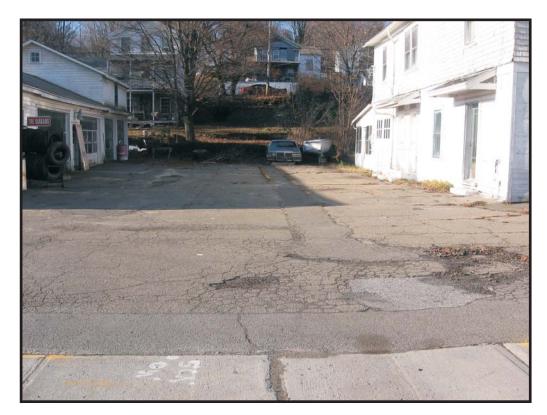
View looking west at south side of house/filling station at 15-21 North Franklin Street.
